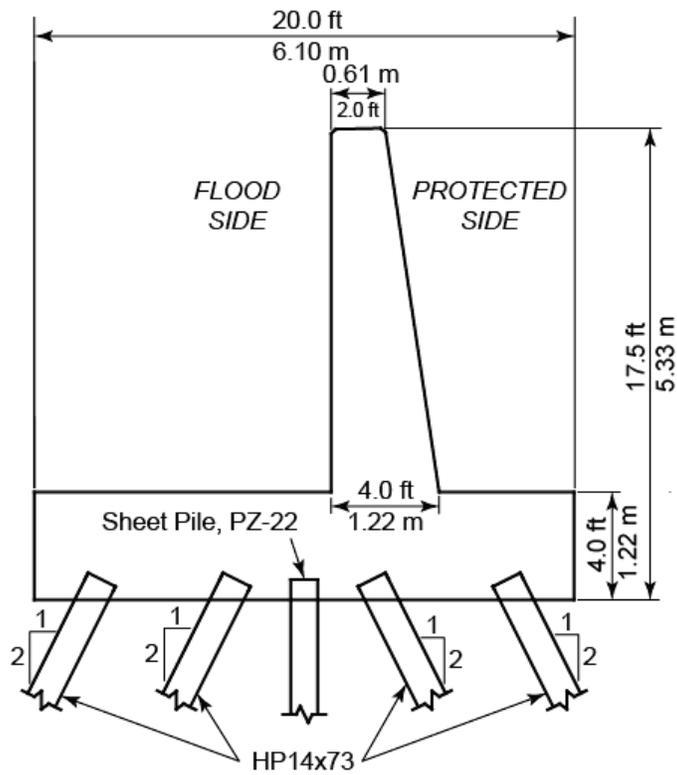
Typical LPV 111 levee profile for the Reinforced Concrete T-Wall (adapted from URS Group, 2008).
